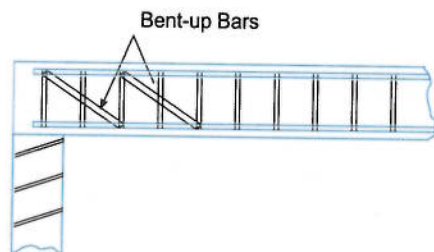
Bent-up Bars and Vertical Stirrups.
